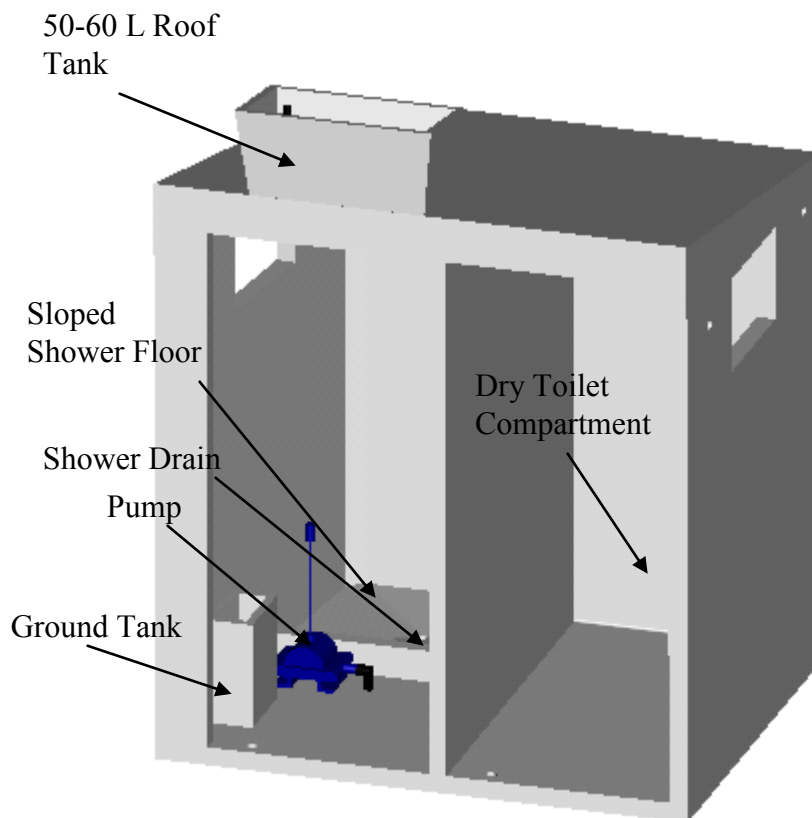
Inside layout of multiple user Enviro Loo dry toilet modular washing facility design (shower on left, toilet on right)
